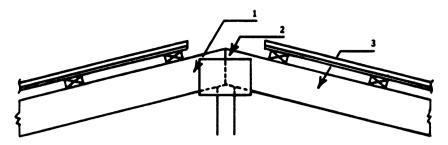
Location of test sites, Barn J. Truss No. 1. 6.1m (20') from east end. West elevation. Flashing not shown
